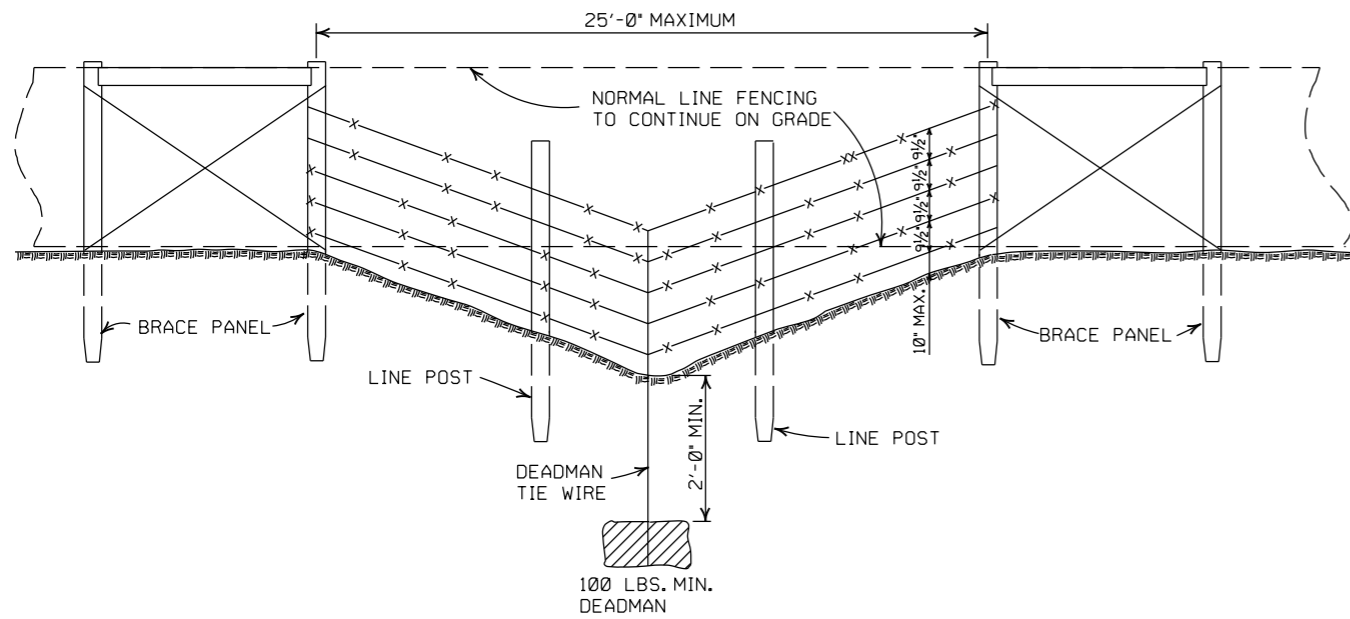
DETAIL OF FENCE CONSTRUCTION AT LARGE CULVERTS (5' IN HEIGHT AND OVER)
